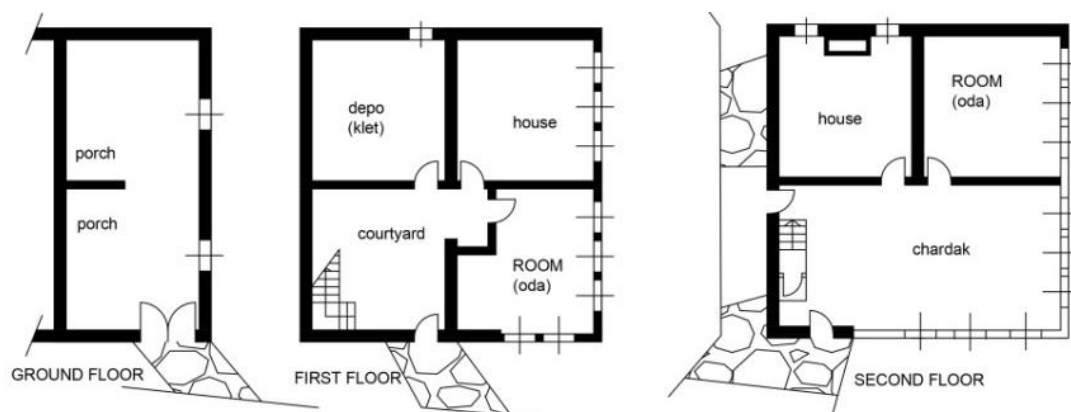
Typical floor plan of the vernacular house from the village Galicnik
